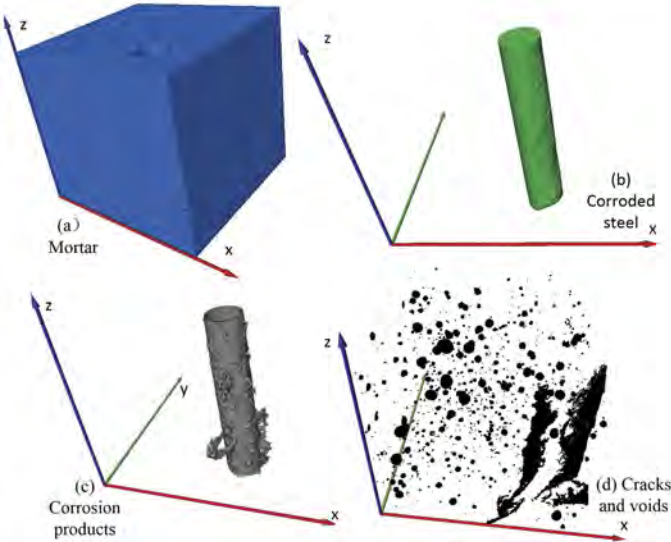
Three-dimensional views of (a) mortar, (b) corroded steel, (c) corrosion products and (d) cracks and voids.
